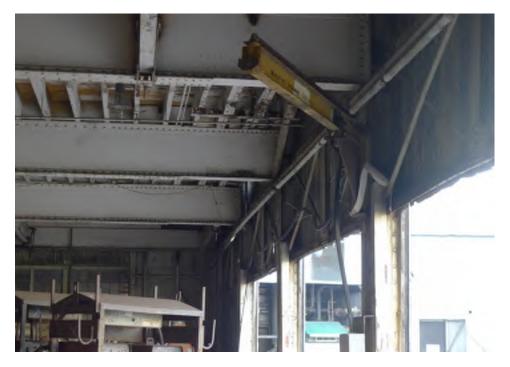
Built-up steel beams in the west side at loading doors, looking south.
